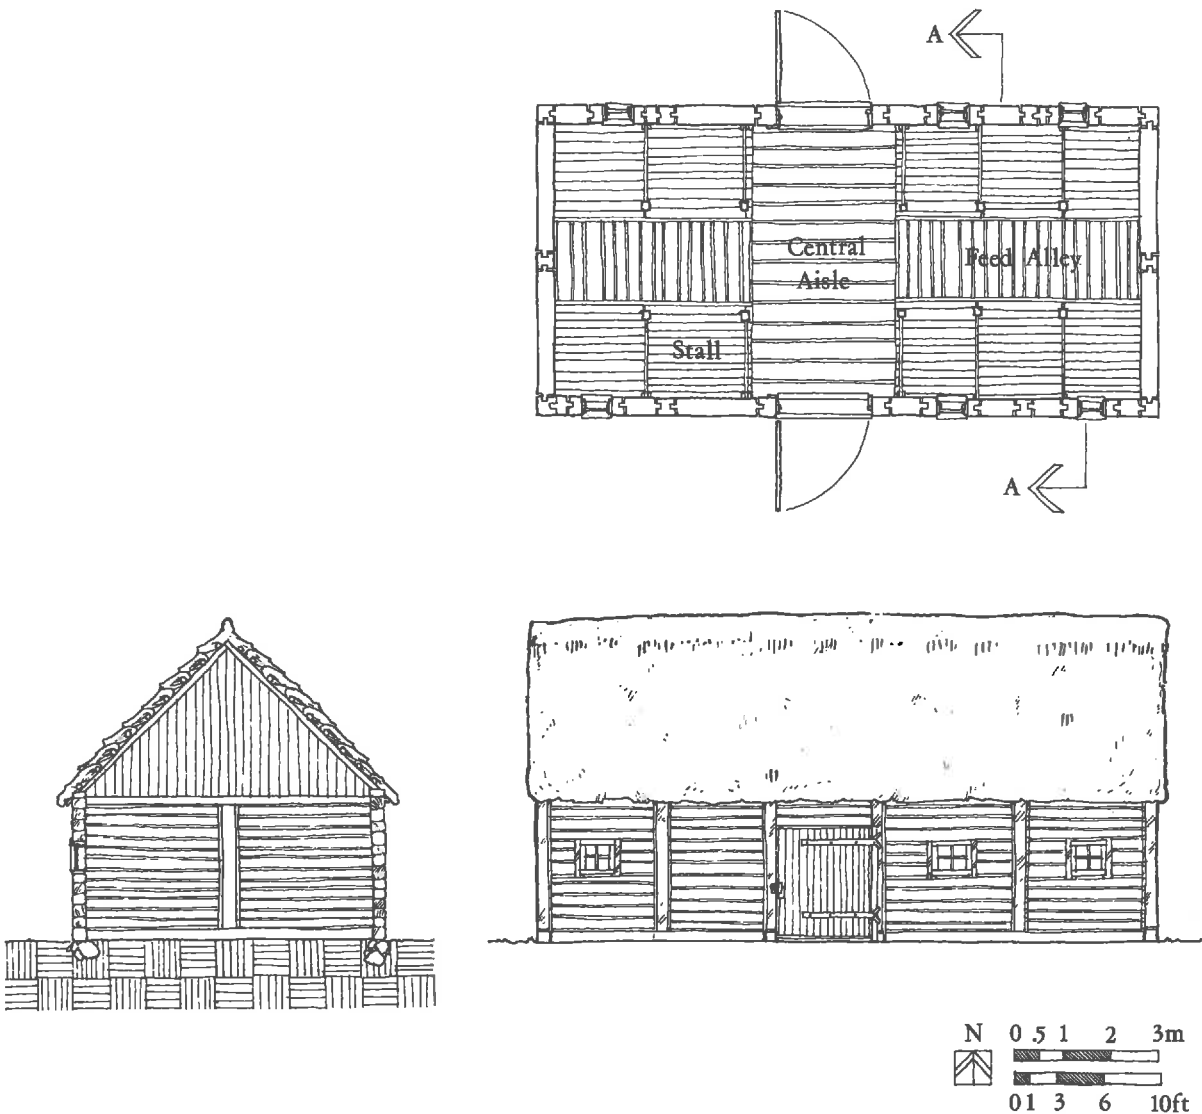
Suggested plan, section and elevation of the original Kuhn barn.
